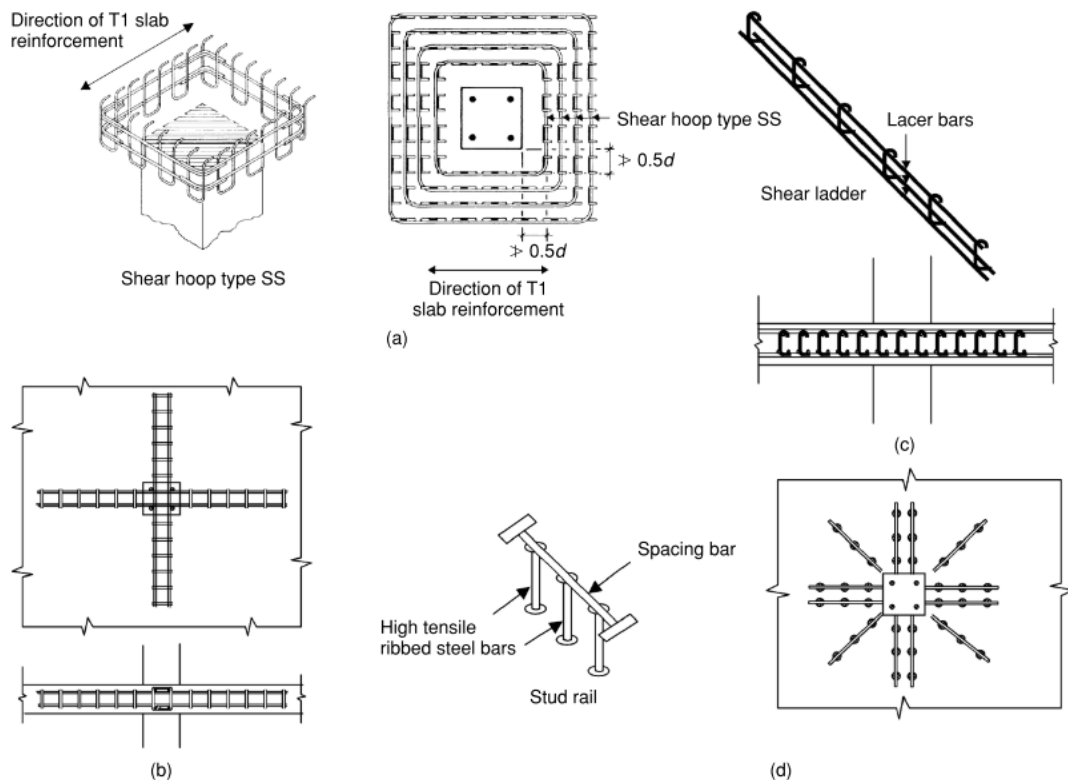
Providing shear reinforcement in various forms (a) shear hoops (b) ACI shear stirrups (c) shear ladders (d) stud rails. Typical arrangements for an internal column (Arya, 2009)
